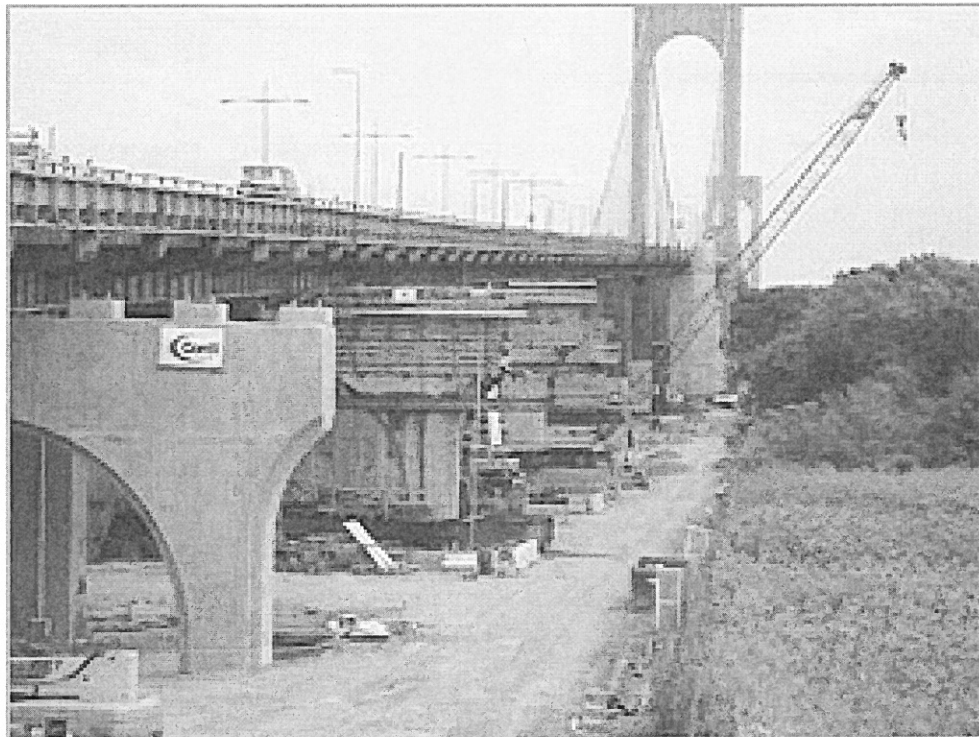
Ongoing construction on the Bronx side of the bridge; note the new pier structures beneath the bridge and limits of disturbance (www.mta.info/bandt/html/btconstruction.html).
